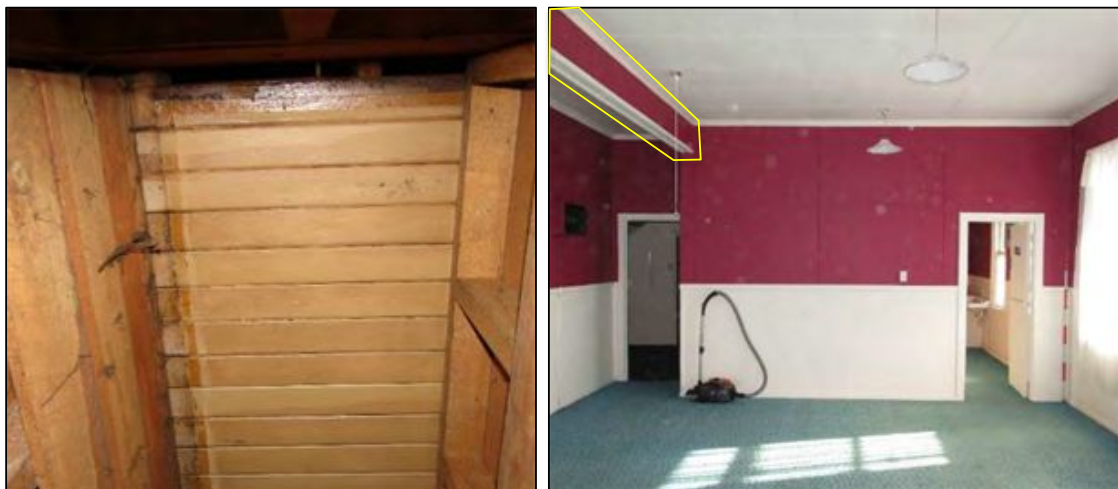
Right: photo of the tongue-and-groove ceiling visible in storage closet, note the paint (north is to the bottom of the photo), Left: photo of Room 25 facing west, beam outlined in yellow in the top left is in line with previous wall.
